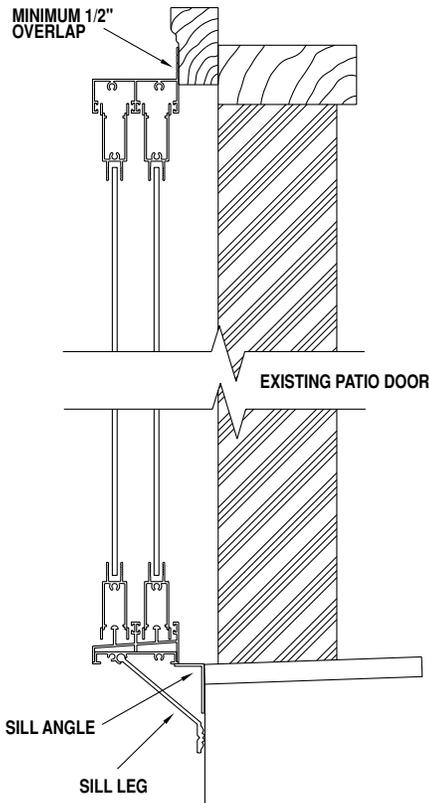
REMOVABLE LOWER TRACK AND SILL SECTION ASSEMBLED
